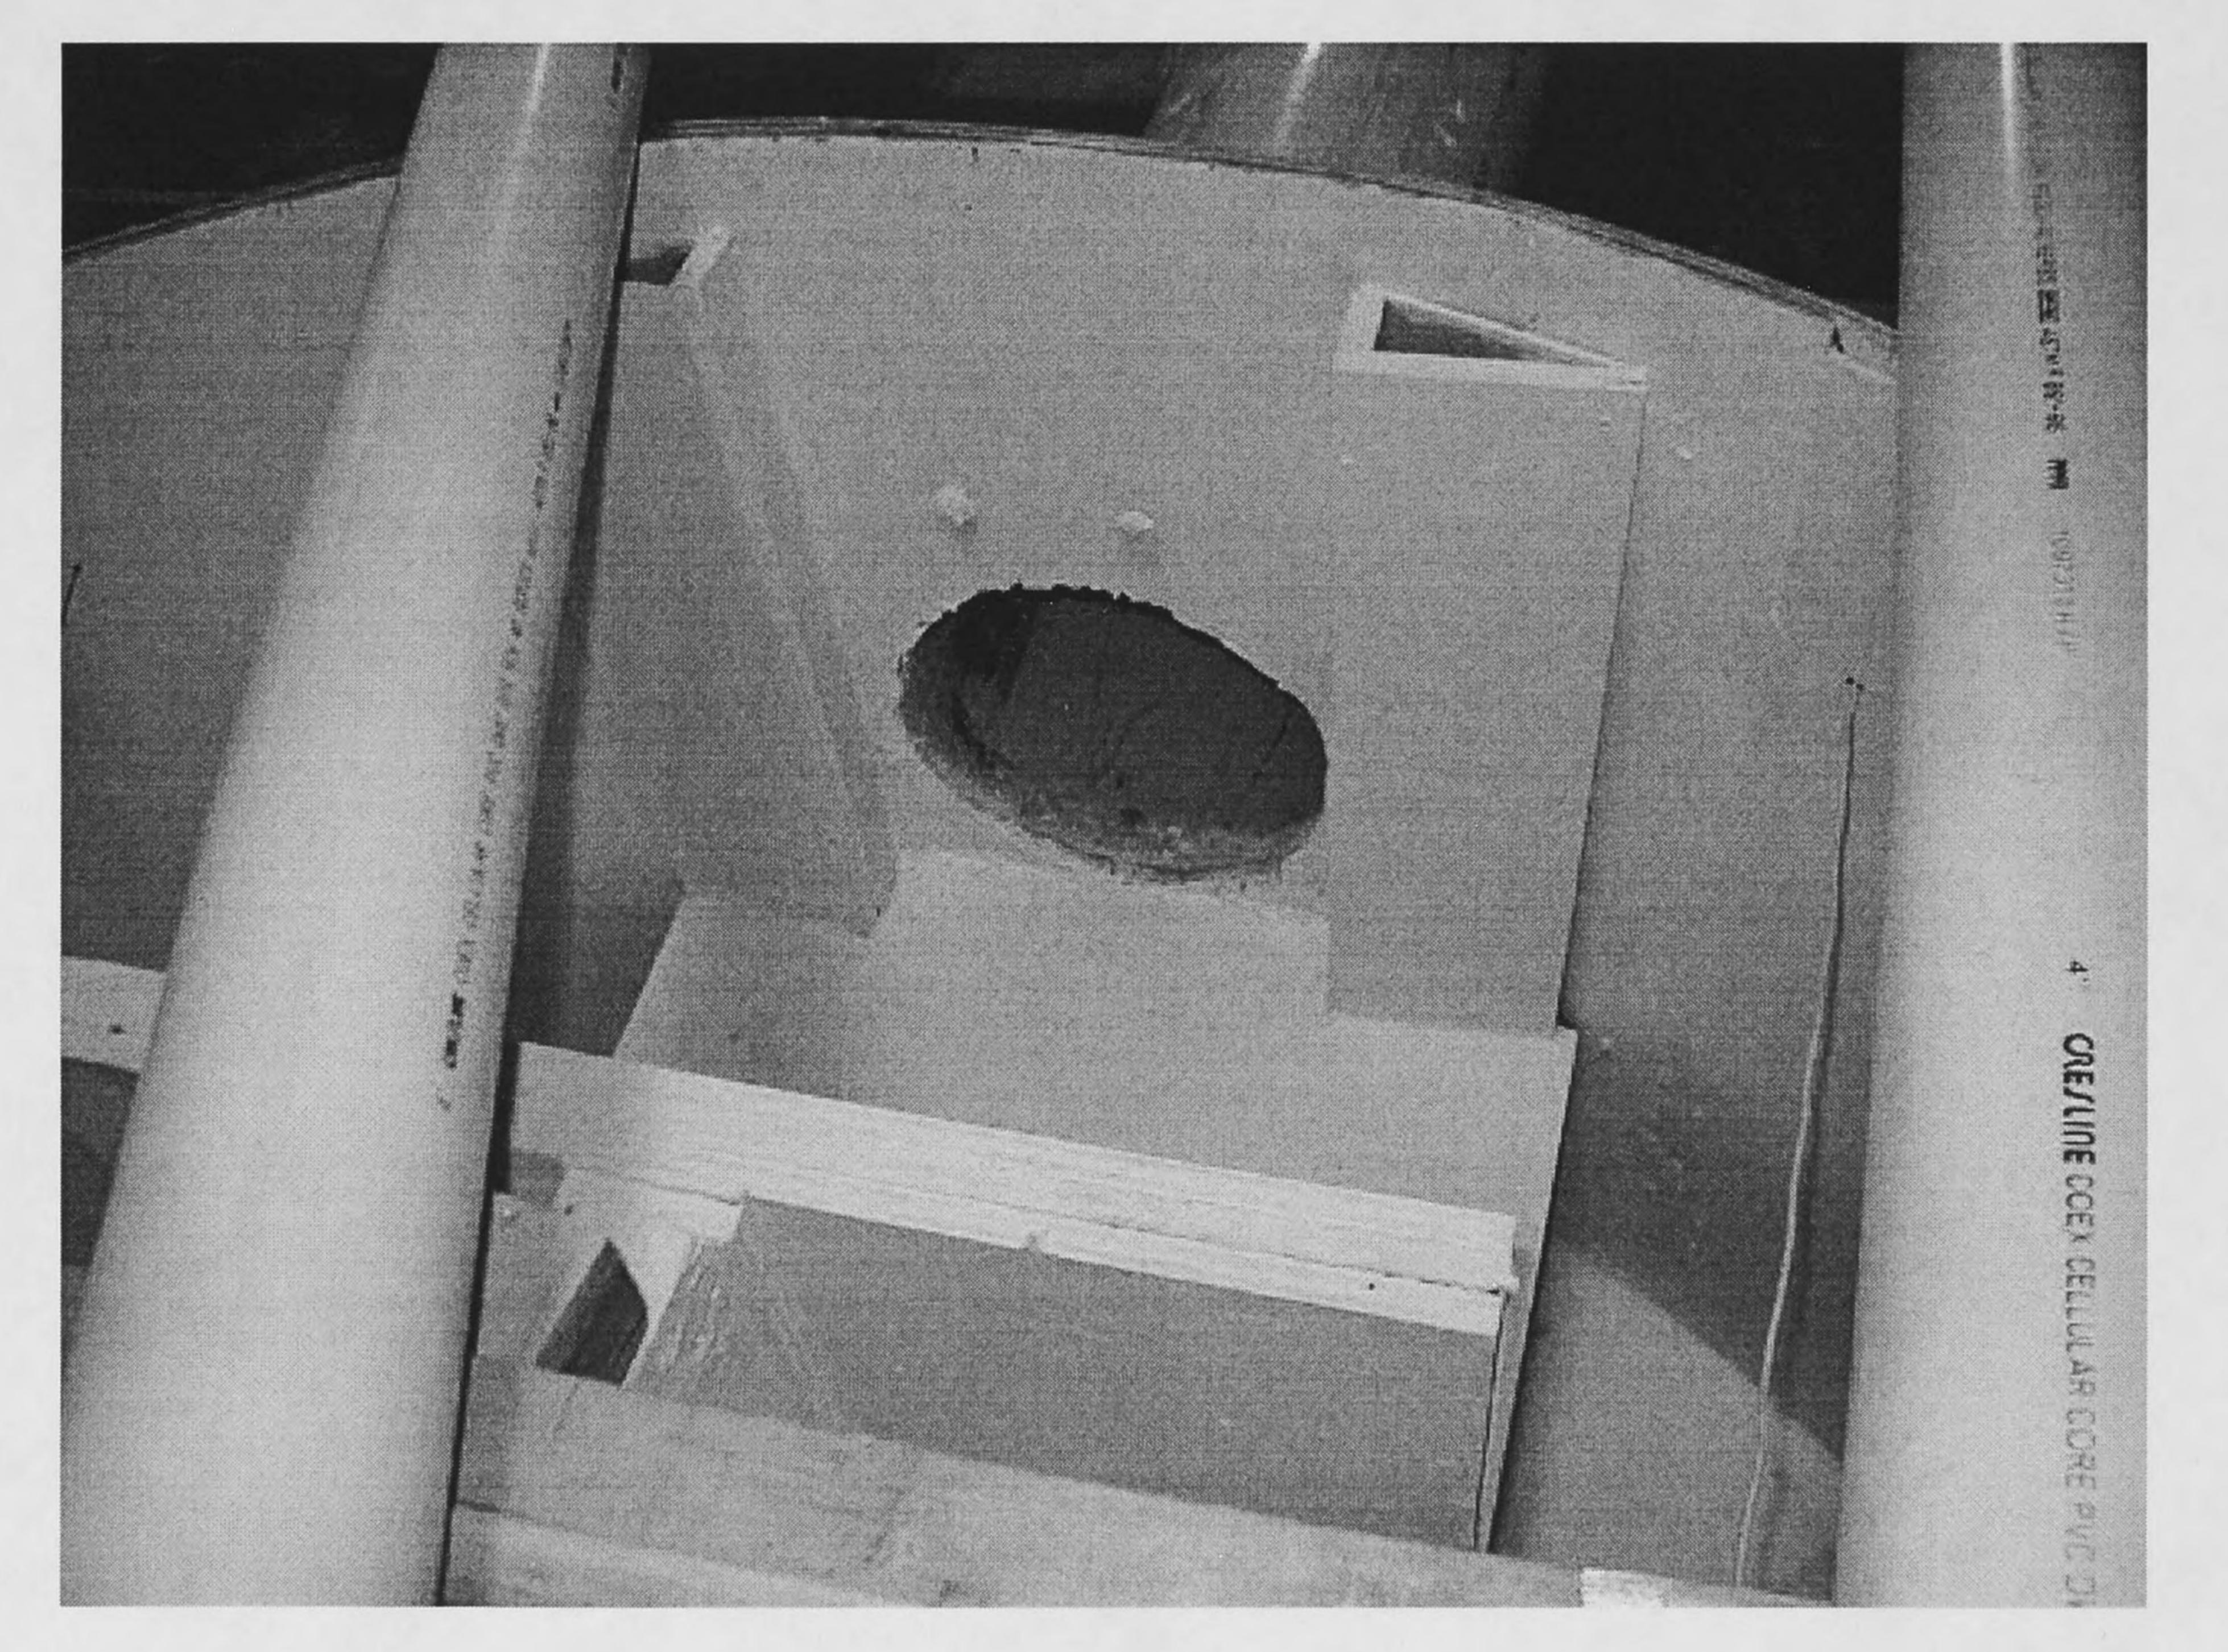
Inlet Tunnel into Wet Well. Note Elevated Inlet Chamber.
